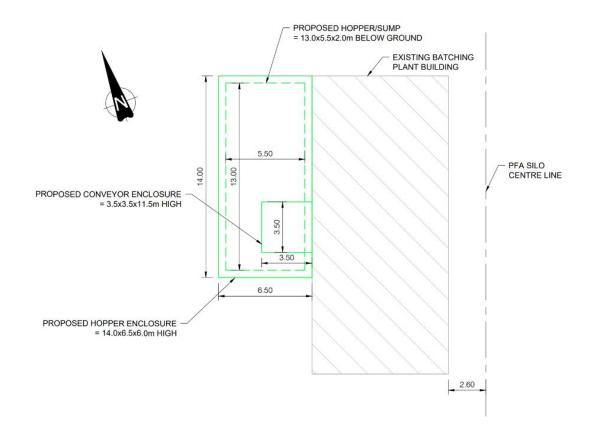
Proposed Batching Plant Building & Hopper Modifications
